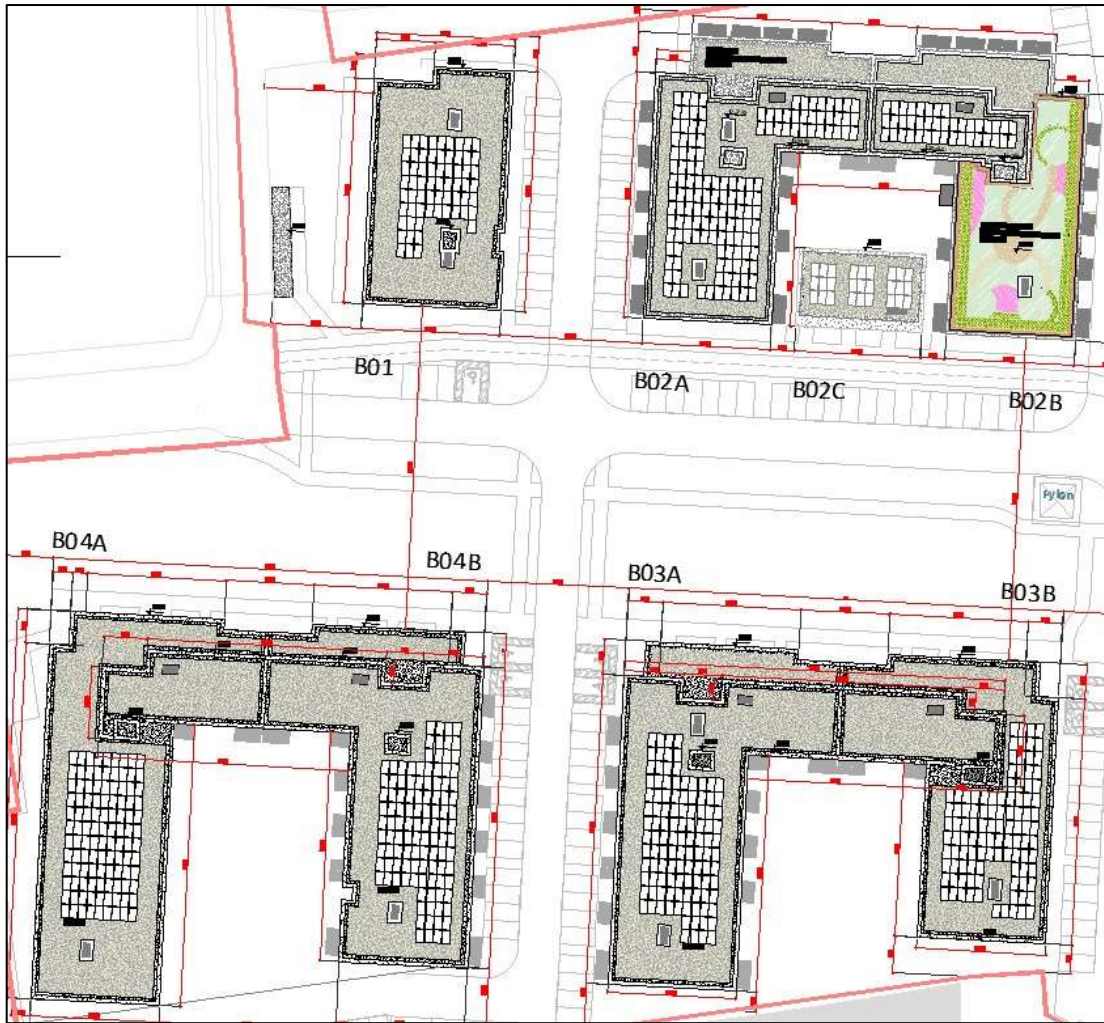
Extract from site layout drawing indicating the locations of the proposed panels (white polygons).
